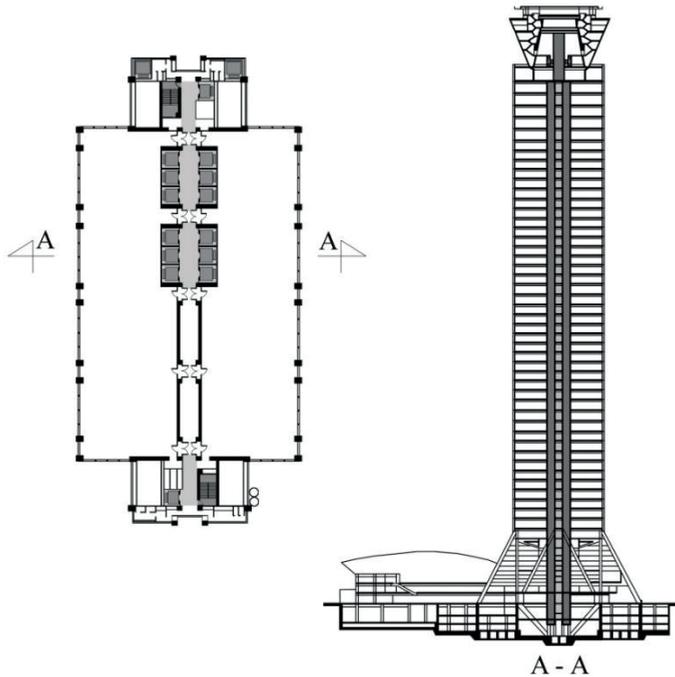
Osaka World Trade Center: floor plan and section, developed by authors [10]
